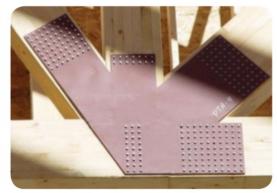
Application of Timber Revits. (Image credit: Specialized Timber Fasteners Ltd, Canada)
